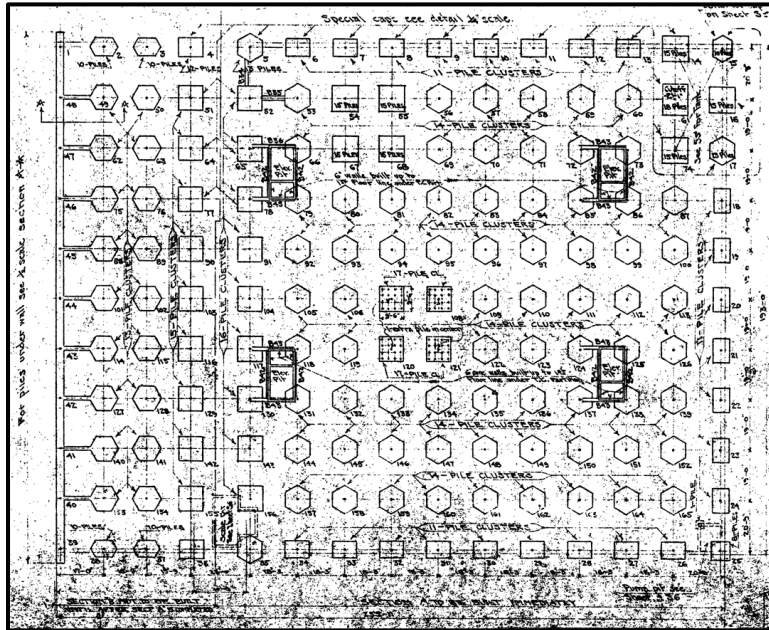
The pile plan from the original design. There are a number of different pile cap arrangements. The square caps of the fourth and fifth vertical grid lines indicate the location of a driveway the full width of the building, since enclosed. A typical pile cap is shown in Figure 4. Note that the pile caps support all interior columns and walls.
